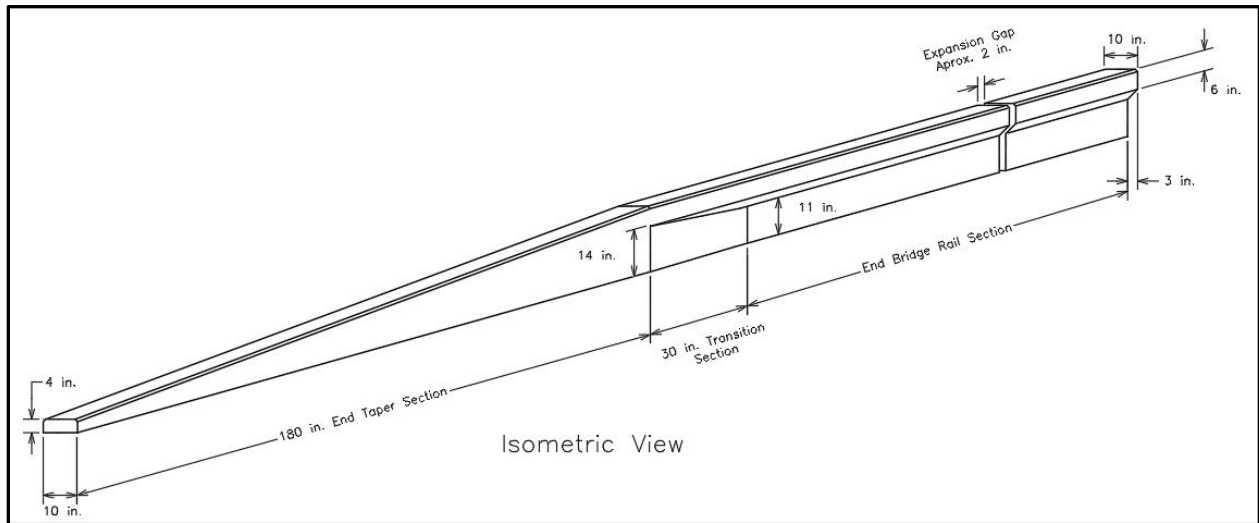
USDA-FS-MT&D Bridge Rail with Sloped Concrete End Treatment [18]
